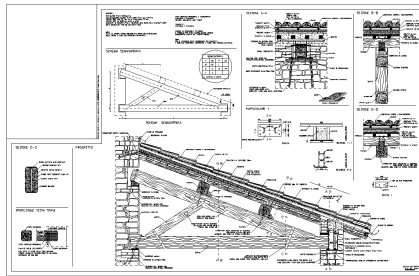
Roof-truss retrofit construction details and typical wood framing to stone masonry wall tie details.
